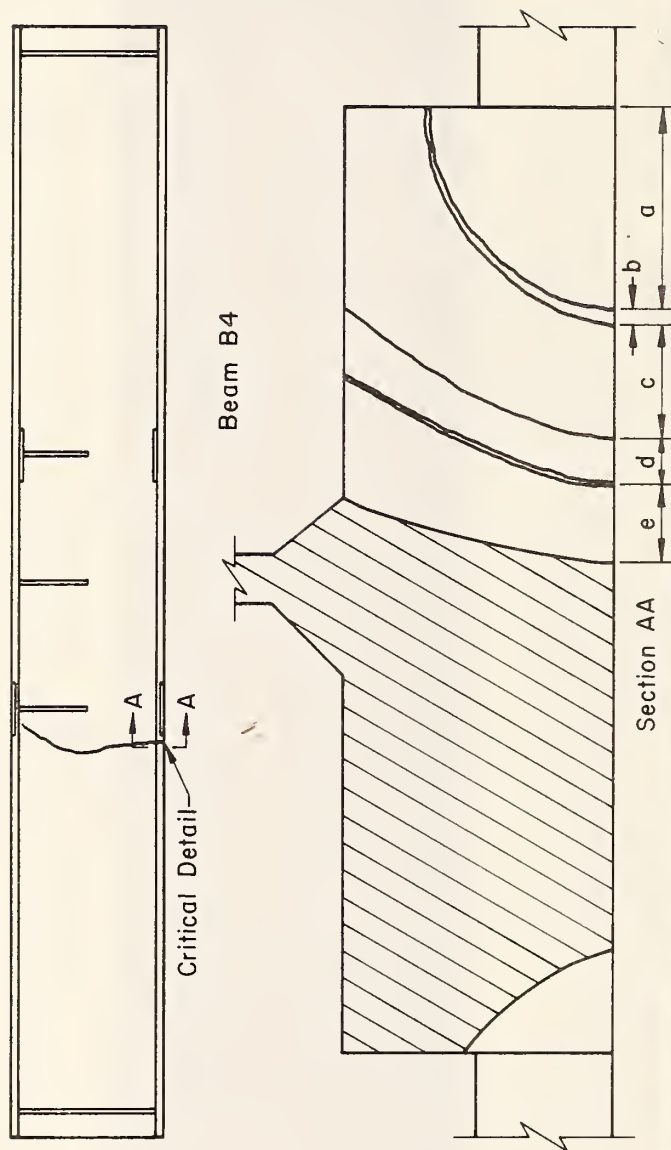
Fatigue and Fracture Surface, B4 (A36)
